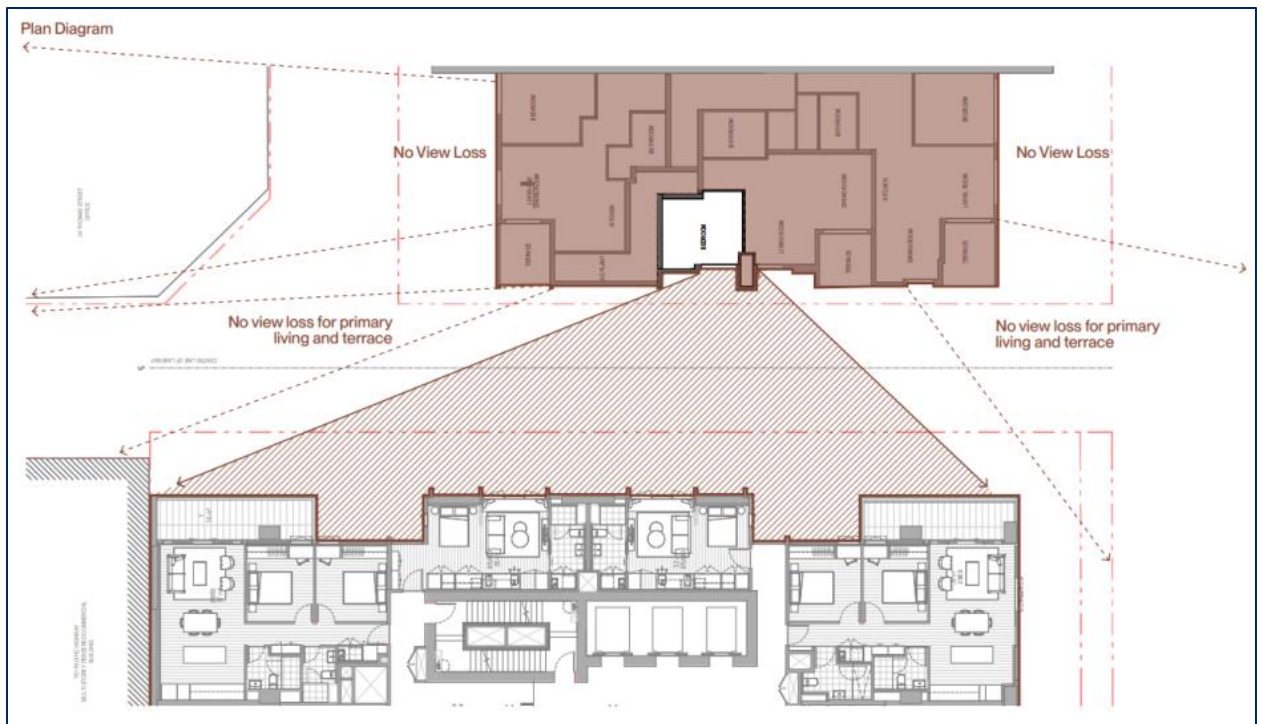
| Key buildings surrounding the site with regards to views. (Source: Applicant's EIS)
